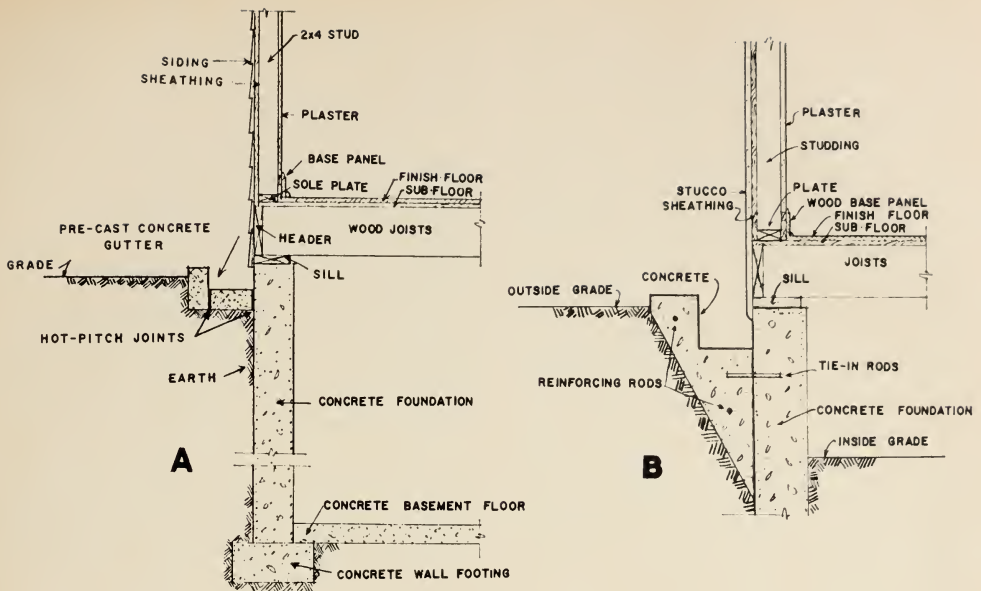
Two types of gutter: A. wall and bottom of preformed slabs; B. poured concrete. (From Heal, 1951.)
